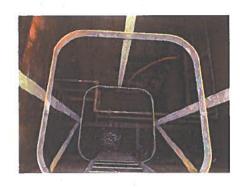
Crumbles Outfall – Outer chamber (Beach) access arrangement.
